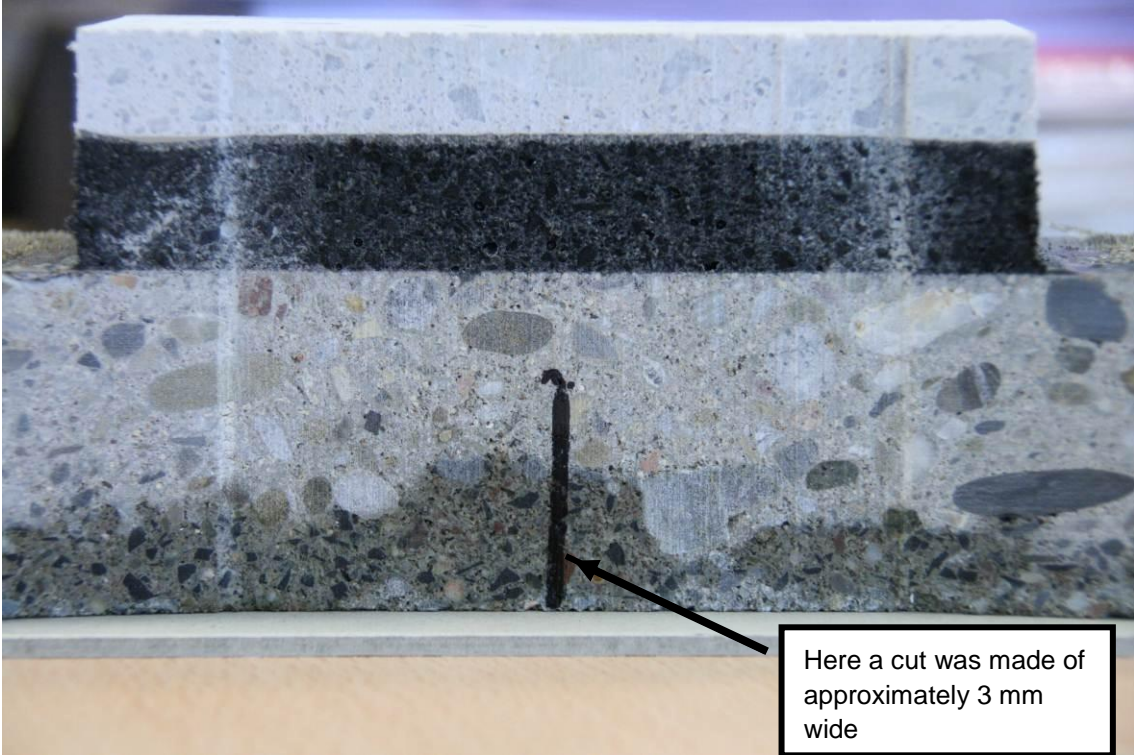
, Place where the cut was made to initiate the breaking of the sample.
